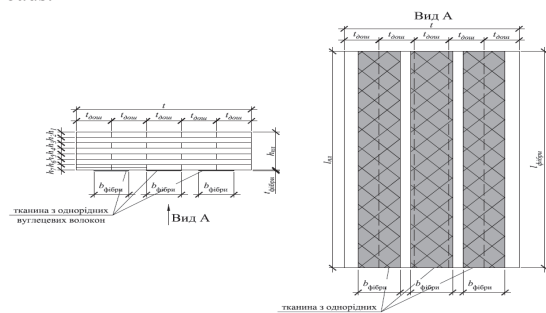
The panel from cross laminated timber is reinforced with composite tapes on the outer layers of the boards.
